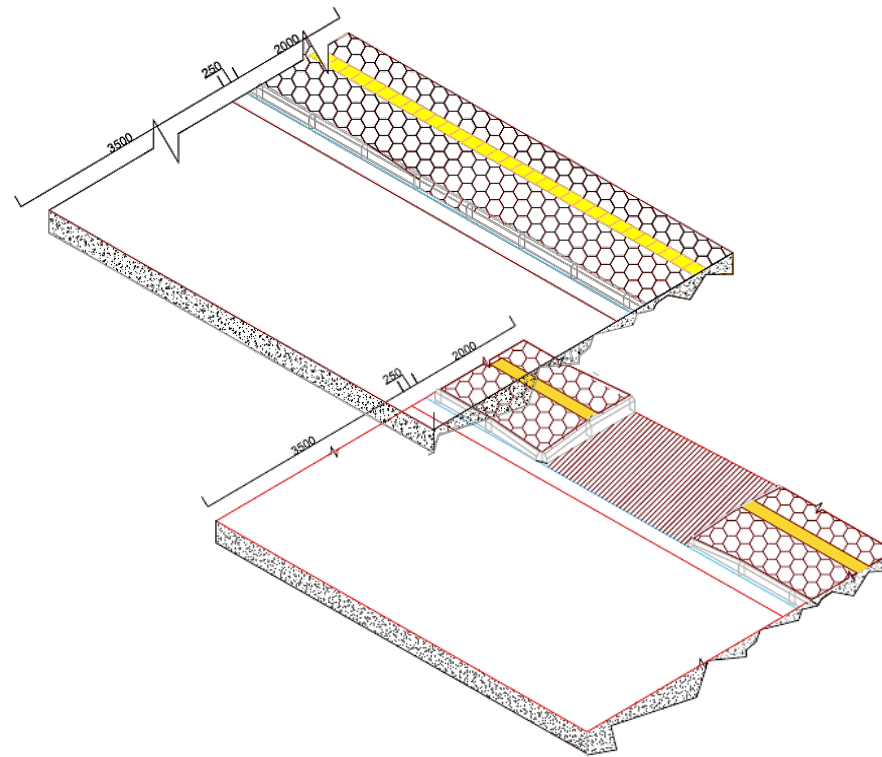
Typical Road Sections with Footpath, Drain with Double Arm Street Light (14m) in Devdaha
